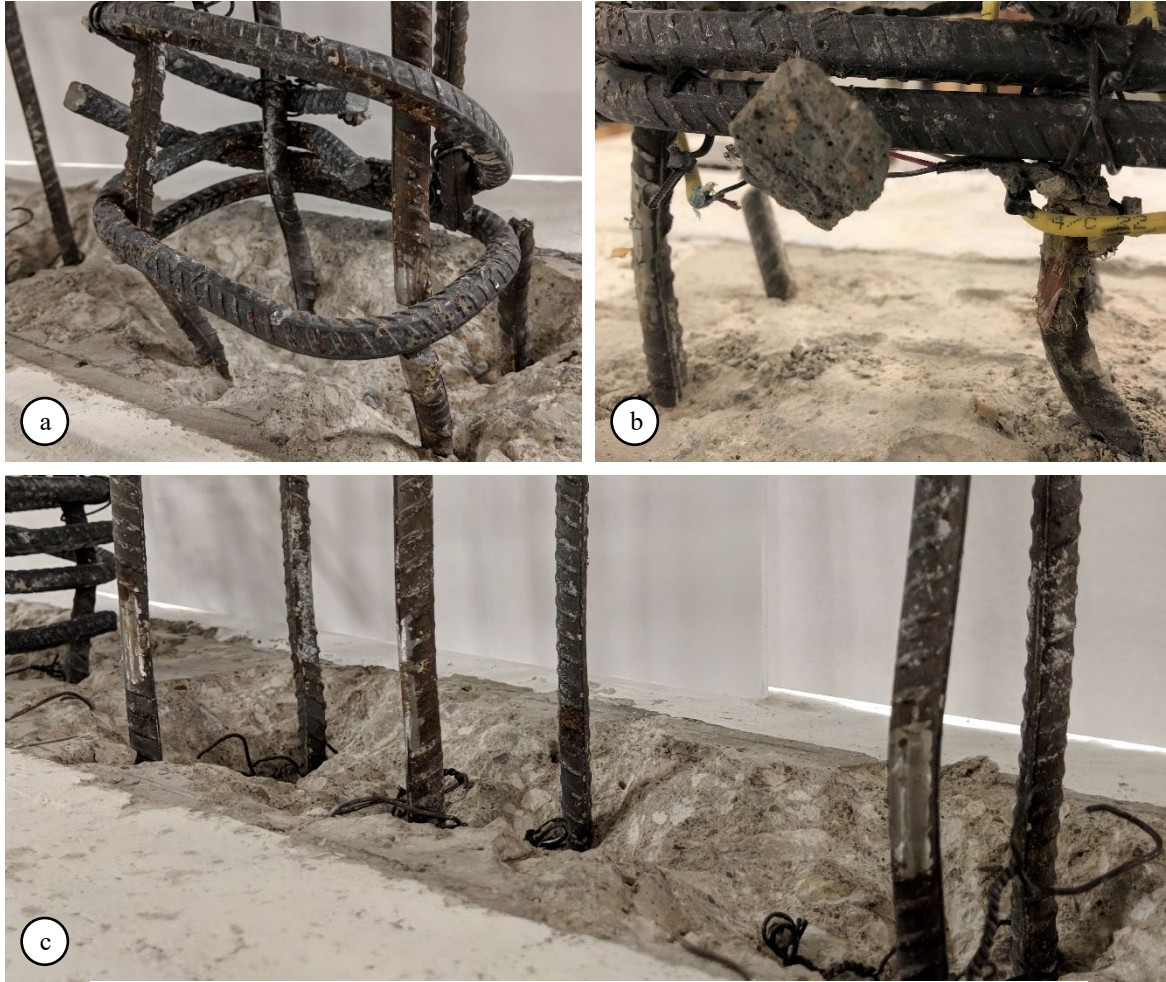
Buckled and ruptured longitudinal reinforcement at the base of Wall SWS-R:
